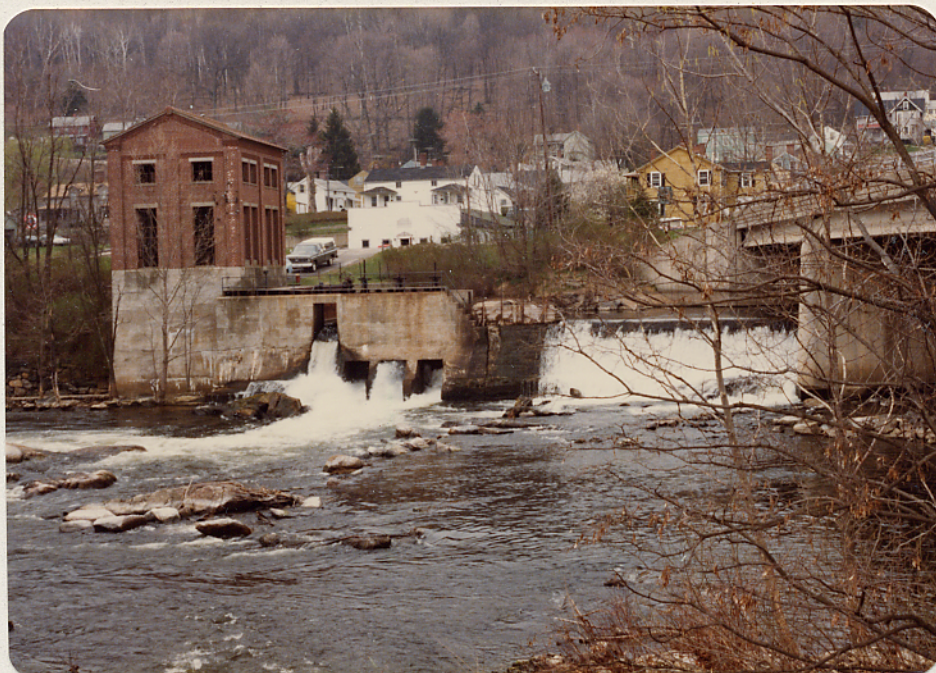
Concrete wing dam and powerhouse at right end of dam.
